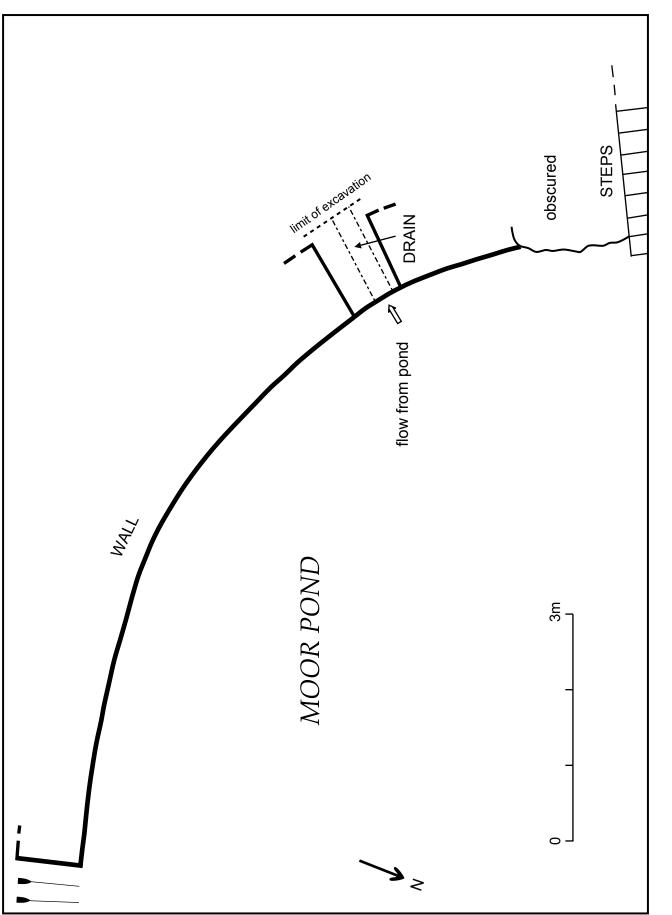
Plan of the walling and drain at the south-west corner of Moor Pond, Papplewick. Scale 1:50
